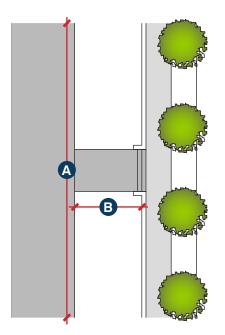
FIGURE: DOORYARD FRONTAGE PLAN VIEW DIAGRAM
